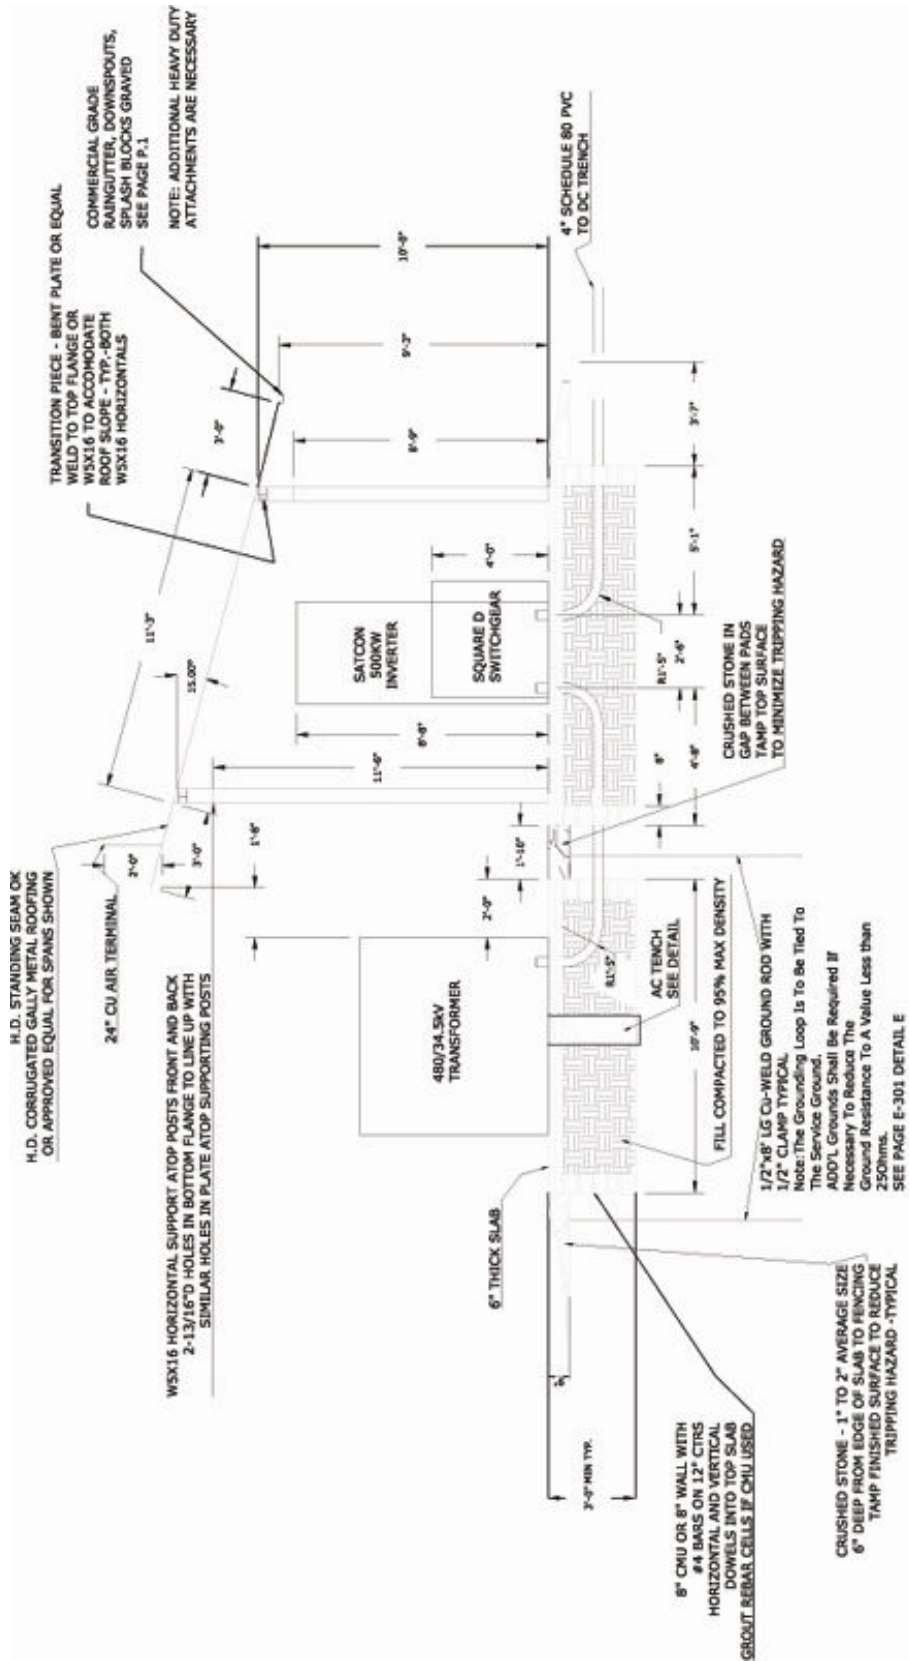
Elevation View CAD Drawing Typical Inverter House
